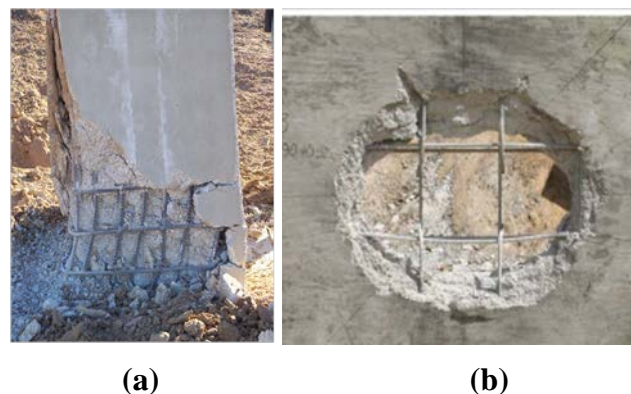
(a) Spall Damage to Concrete Column Sides and Cratering Damage to Front Face [24], and (b) Breach Damage [107]
